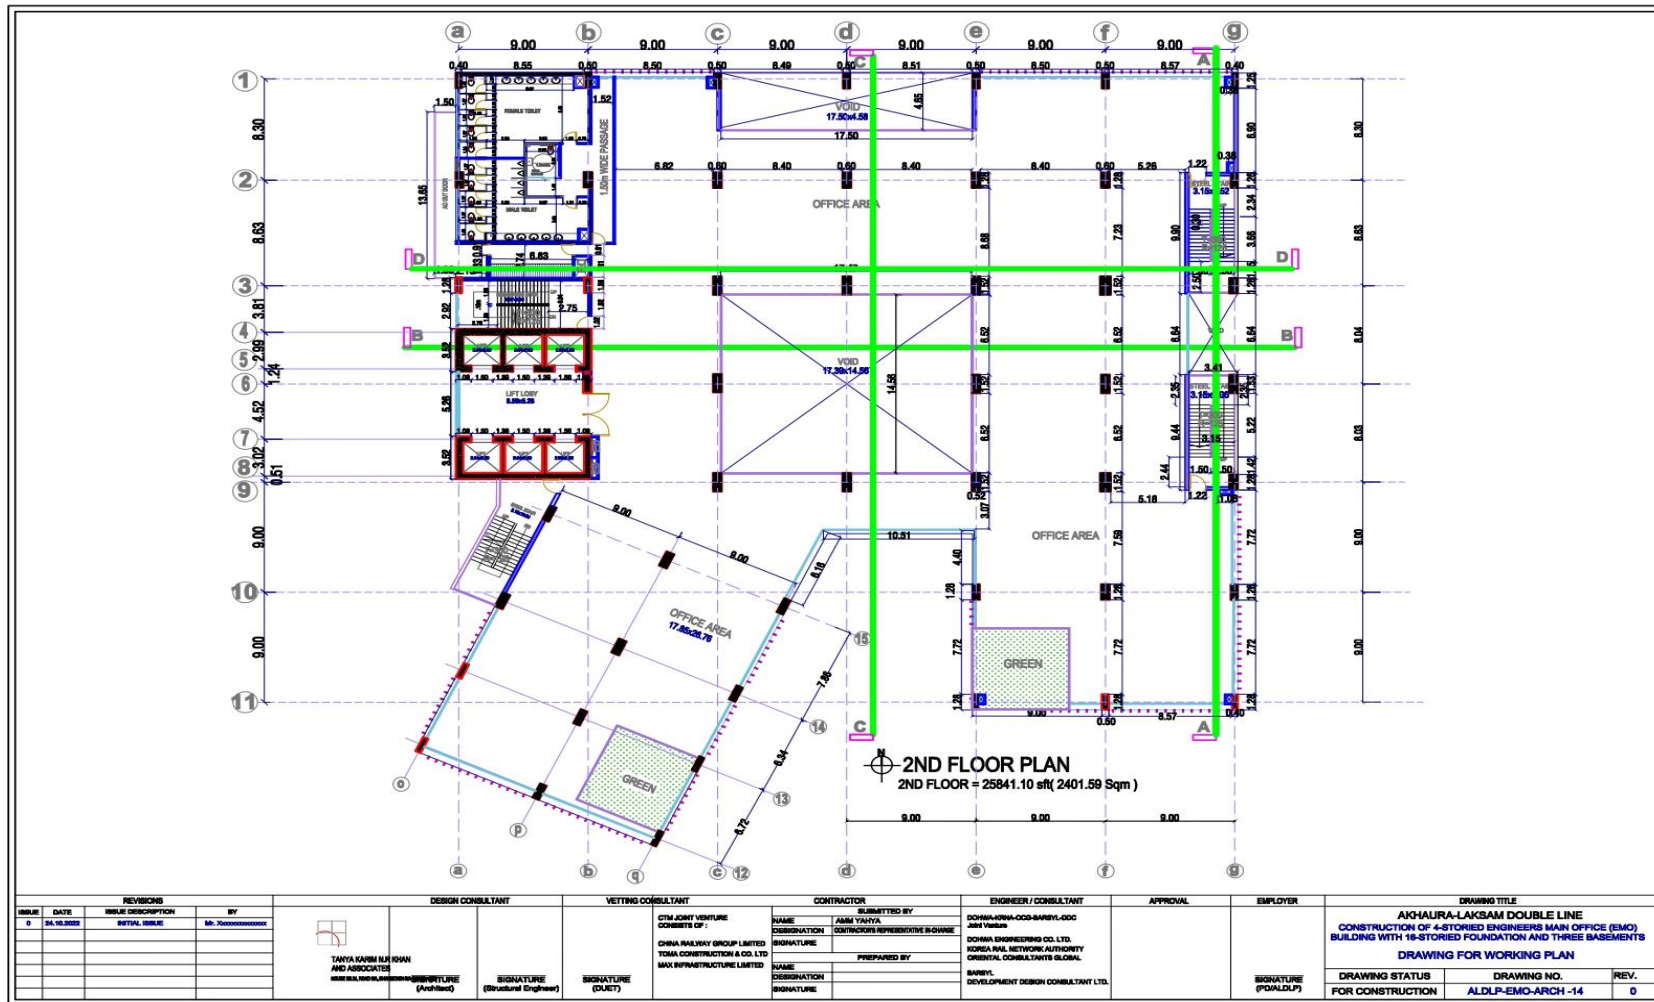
Layout Plan of Proposed EMO Building (2nd Floor)
